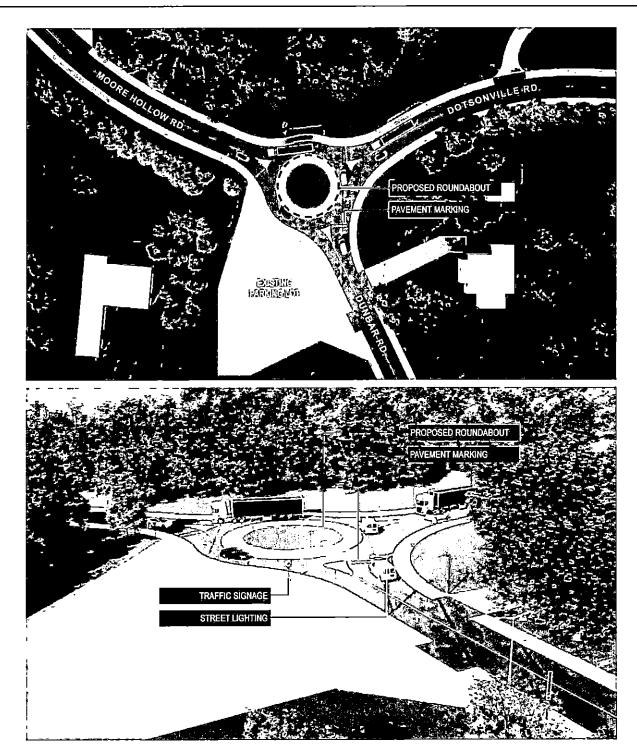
Dotsonville Road proposed conditions, plan view & axonimetric view above. Proposed improvements to include:
